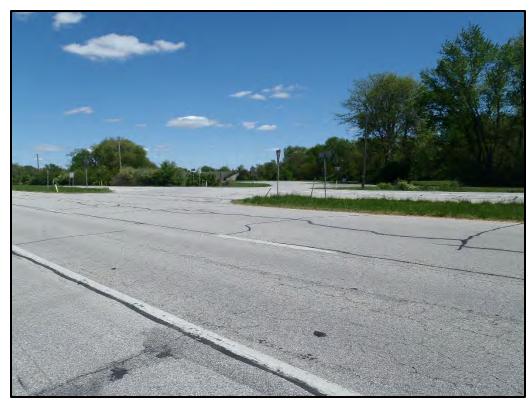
Looking northeast from the Quinn Rd and US 41 intersection (5-5-21).
